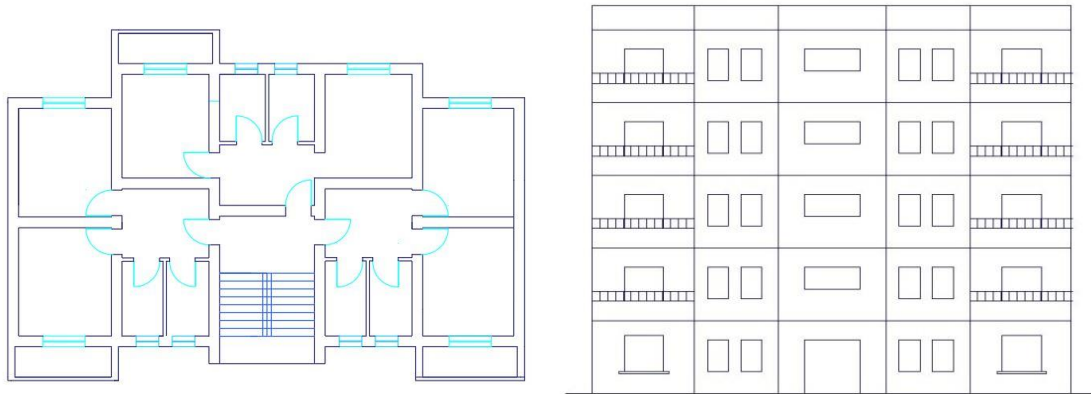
Template B3 plan and façade view [AQTN, 2018]
